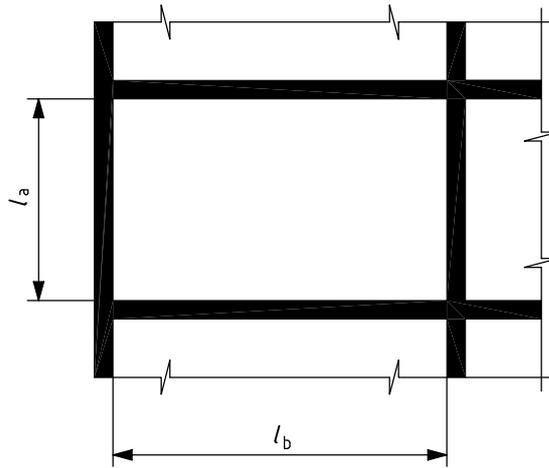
Edge panel with l_a parallel to the edge of two-way slabs supported on girders, beams or walls
